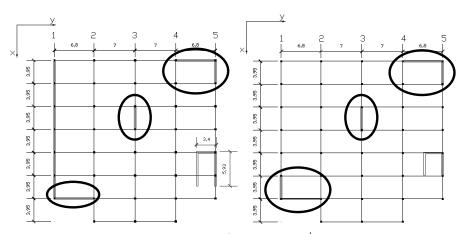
Additional walls:  $1^{st}$  floor (left),  $2^{nd}$  floor (right)
